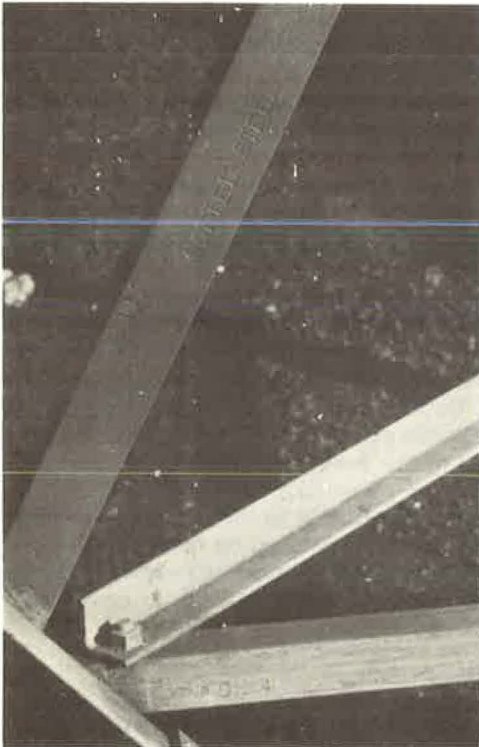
High-strength low-alloy steel angle on galvanized steel transmission tower after 15 yr of exposure, Gary Steel Works.
